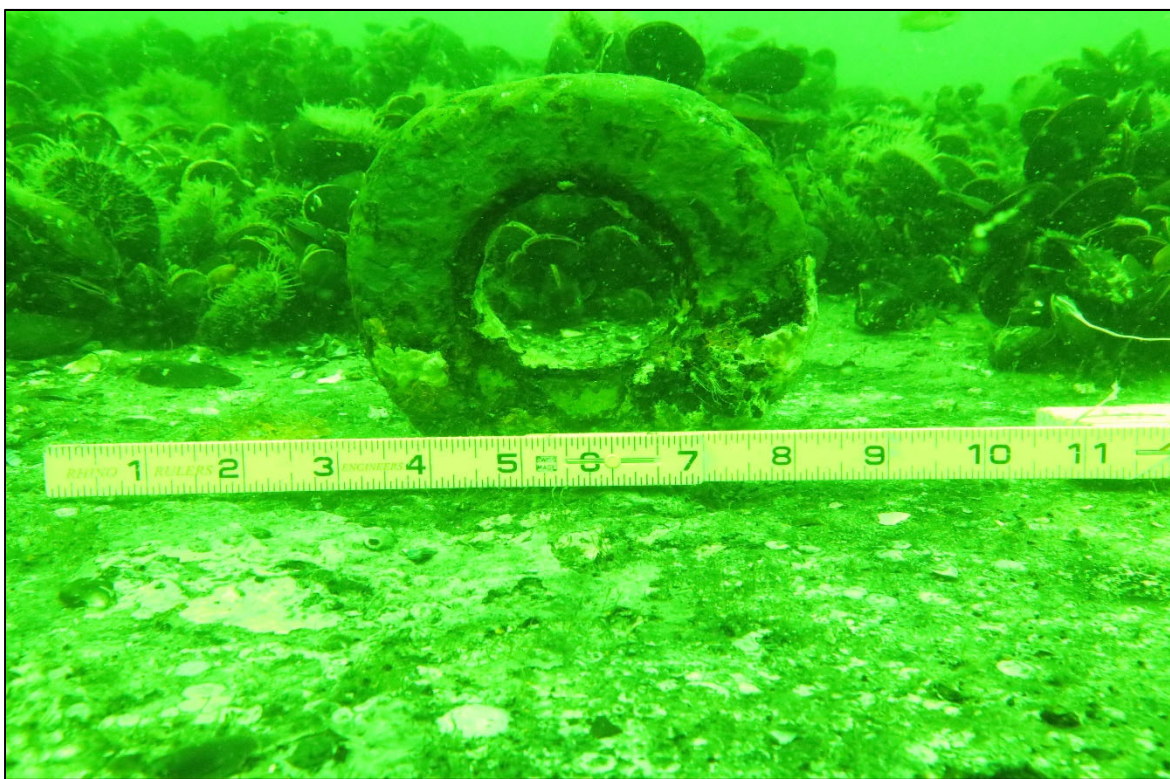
Typical Padeye on Cleanout Chamber Cap Southeast Padeye.
